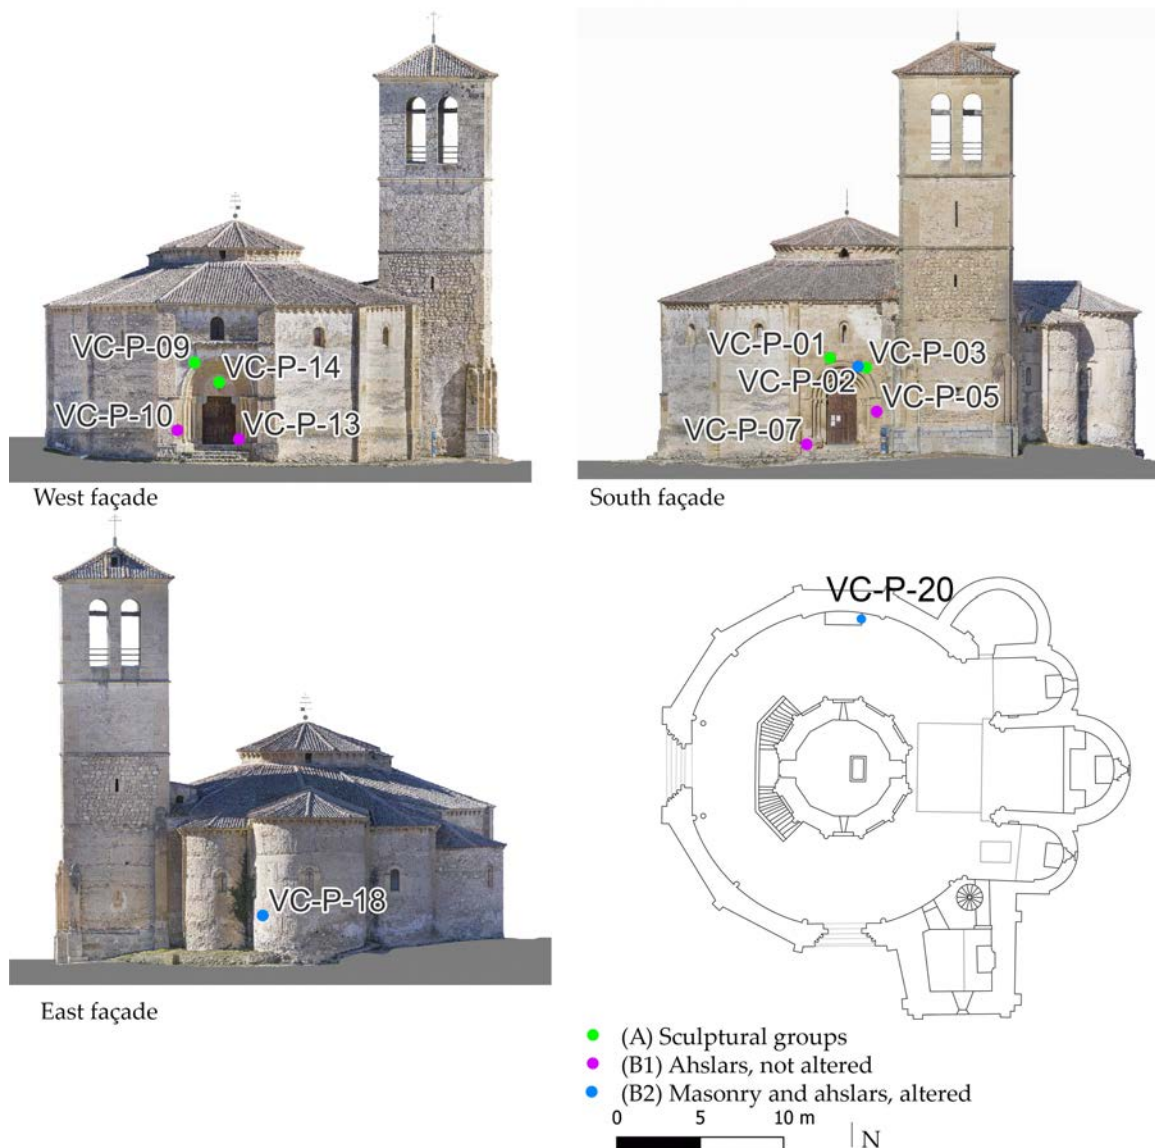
Location of samples in the outside of the building. East façade: VC-P-18 (Apse). South façade: VC-P-1 (sculptural ensemble on the door); VC-P-2 (decorations on the door); VC-P-3 (ashlar facing above the door); VC-P-5 (Impost); and VC-P-7 (Baseboard). West façade: VC-P-09 (decorations above the door); VC-P-10 (Ashlar on the baseboard); VC-P-13 (inner part of the ashlar on the baseboard); and VC-P-14 (Sculptural ensemble in the door). Interior: VC-P-20 (Altar). Orthoimages: Luis-Javier Sánchez-Aparicio. Layout: Diego Vicente Sánchez.
